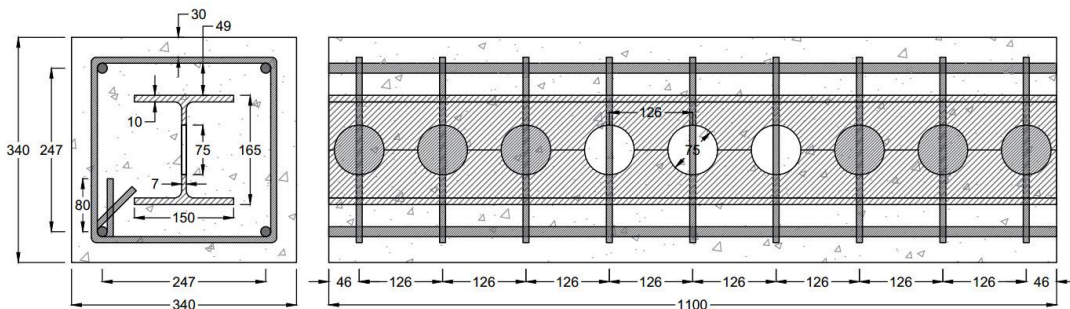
Reinforcement details of W-126 column; (a) cross-section; and (b) longitudinal section (dimensions in mm).
